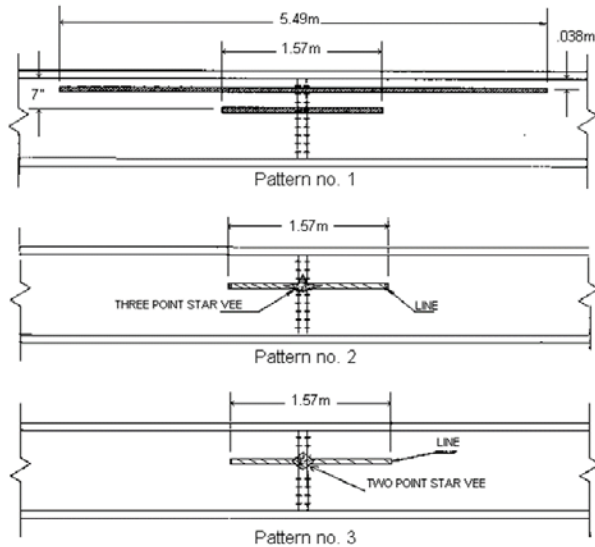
Repaired sections (length) of the Iowa steel bridge
